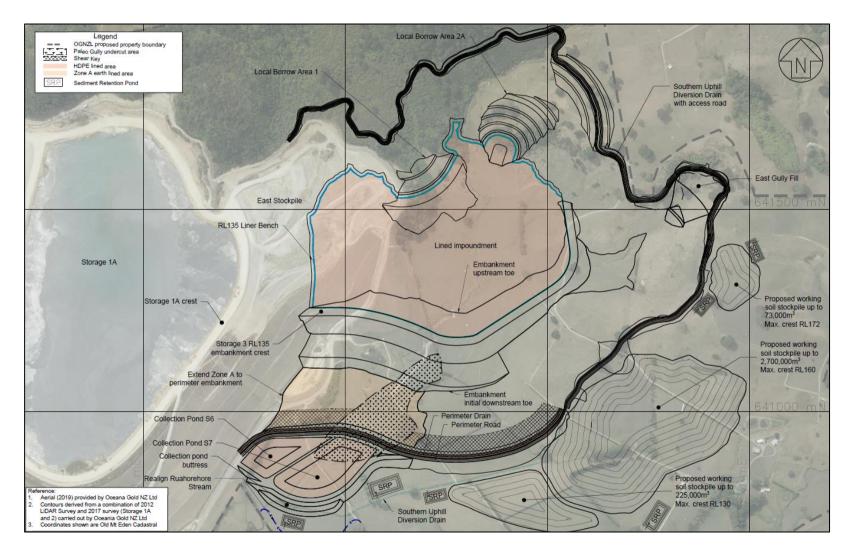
Concept Plan of TSF3 Starter Embankment to 135 m RL (EGL (2025c)
